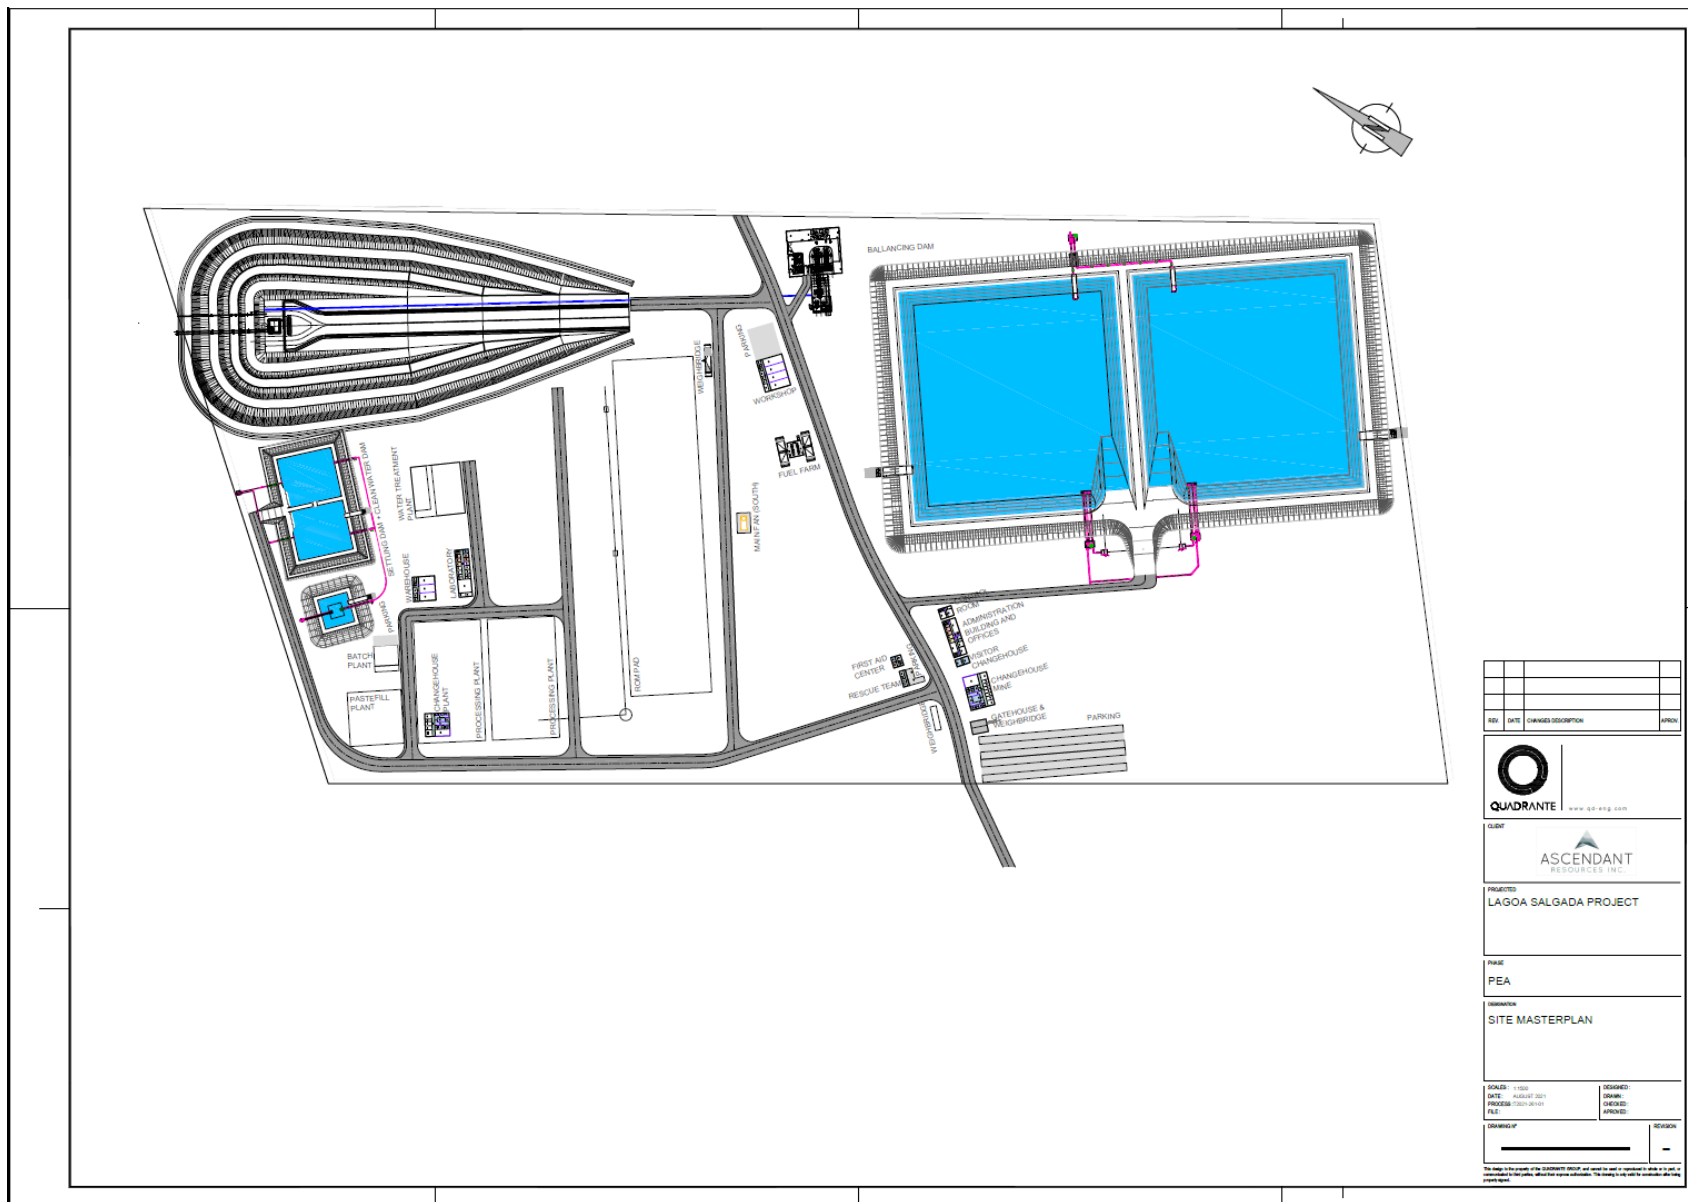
Project infrastructure – Surface infrastructure layout
